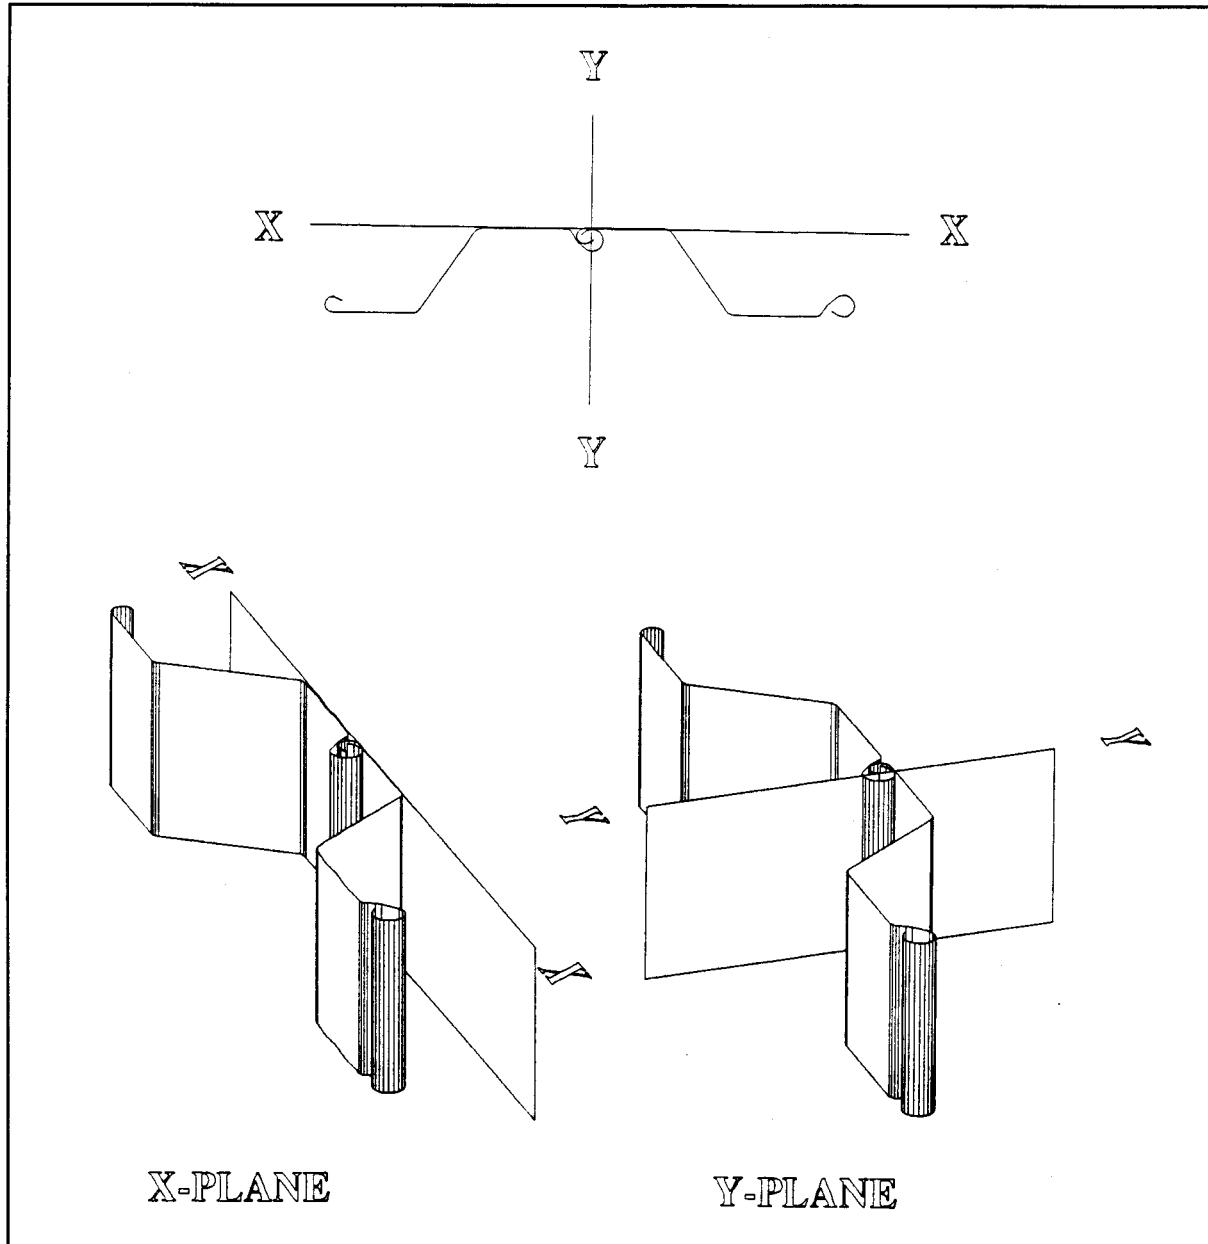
Waterloo Barrier™ Sheet Pile Axes
